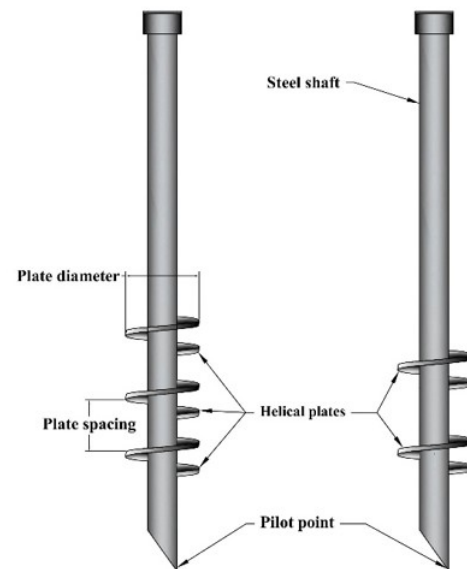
Layout and components of a standard helical pier used for soil strengthening.
